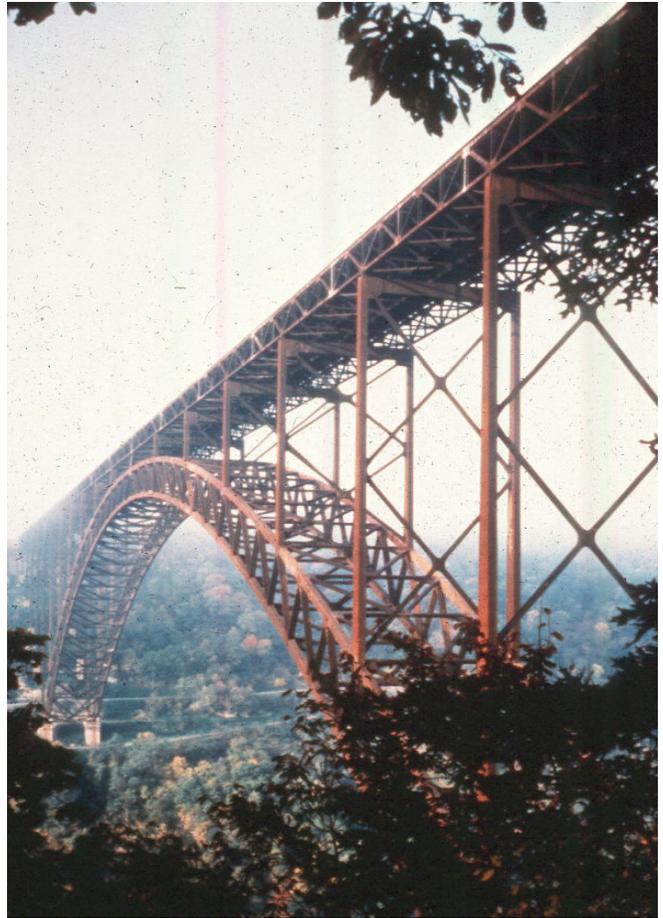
Braced Rib Deck Arch, New River Gorge, WV
